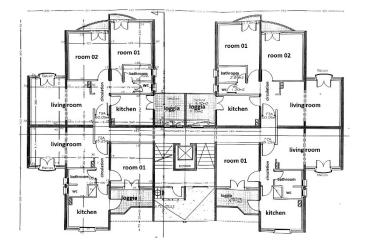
Floor plan F3 and F2—linear block (Source: OPGI, 2023)
